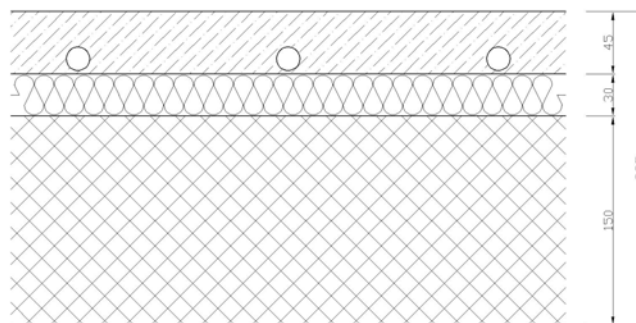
Radiant heating and cooling floor. Pipes were spaced 150 mm
